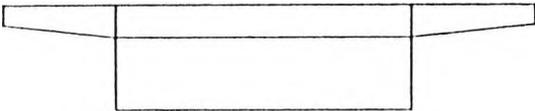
BRIDGE GIRDER CROSS-SECTIONS.
